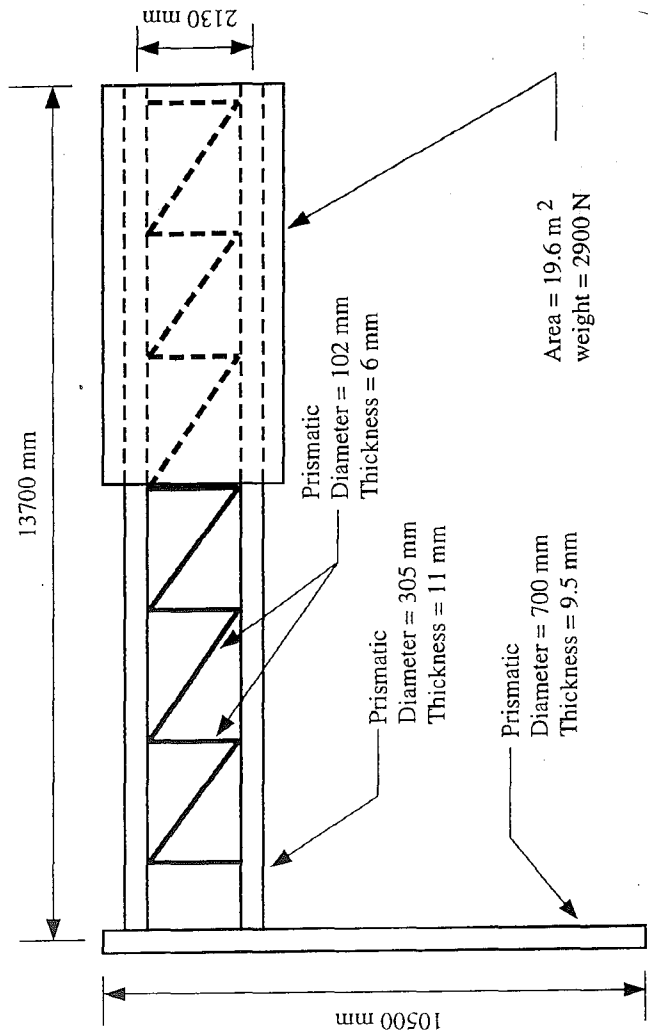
Details of Full-Scale Cantilevered Sign Support Structure (Sign Support #1).
